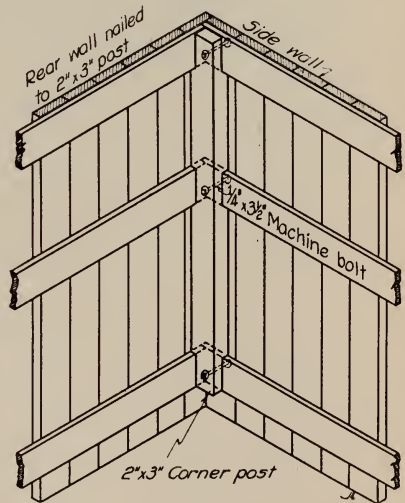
Detail plan showing the method of constructing the corners of the 8 × 8 foot knock-down poultry house.
